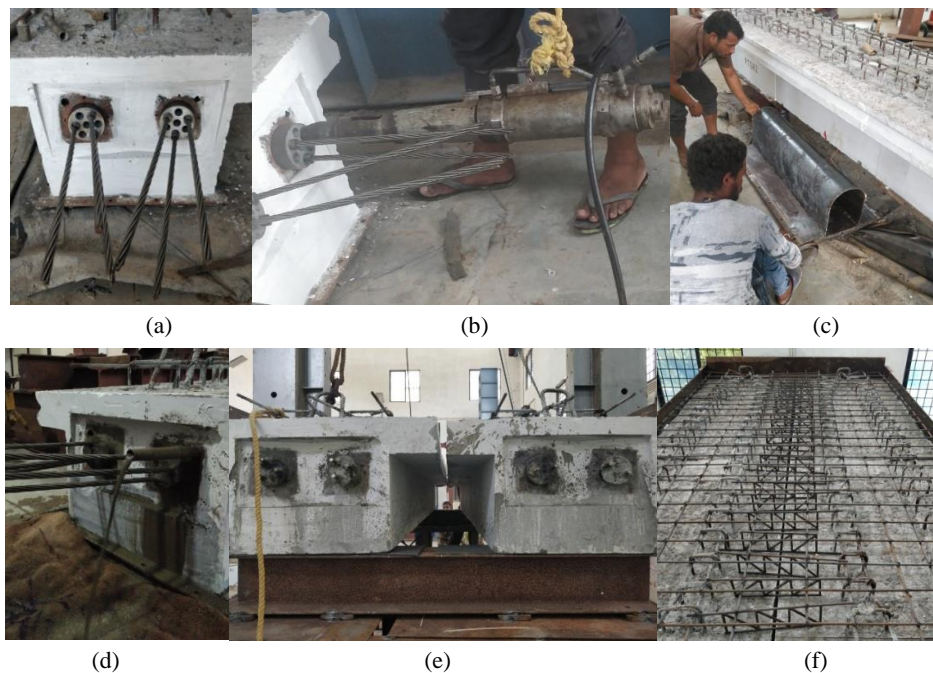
Stages of pre-stressing and casting of integrating slab, a) Arrangement of strands including one dummy strand, b) Prestressing, c) Removal of interior shutter after stressing one strand from each cable, d) Grouting, e) Launching of girders at 25mm gap, f) Deck slab reinforcement including for shear friction.
